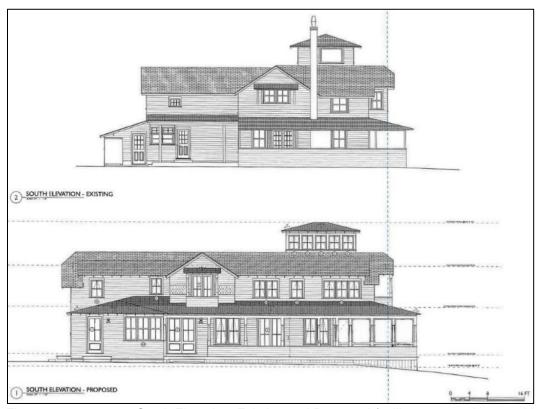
03.06.2023, South Elevation, Existing and Proposed (sullivan + associates architects).
